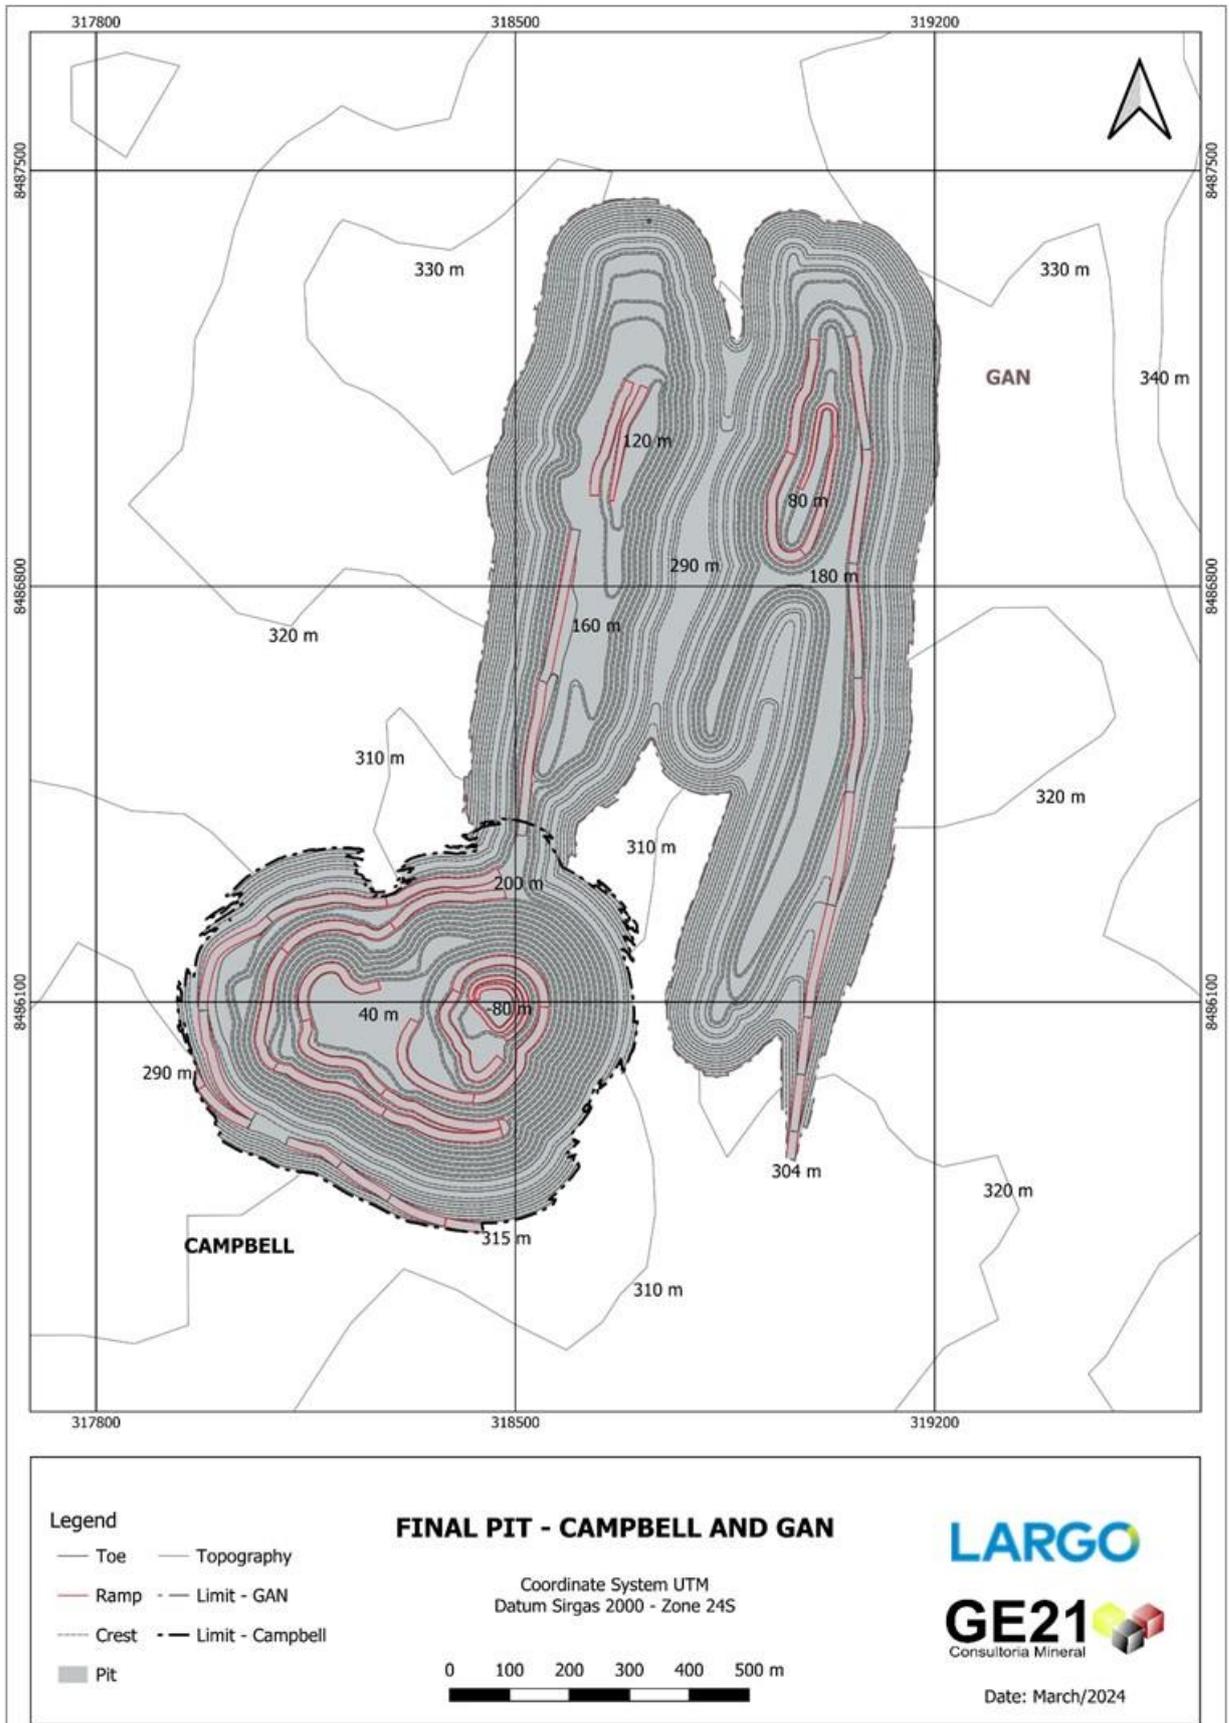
Campbell Pit and GAN – Final Pit Design
